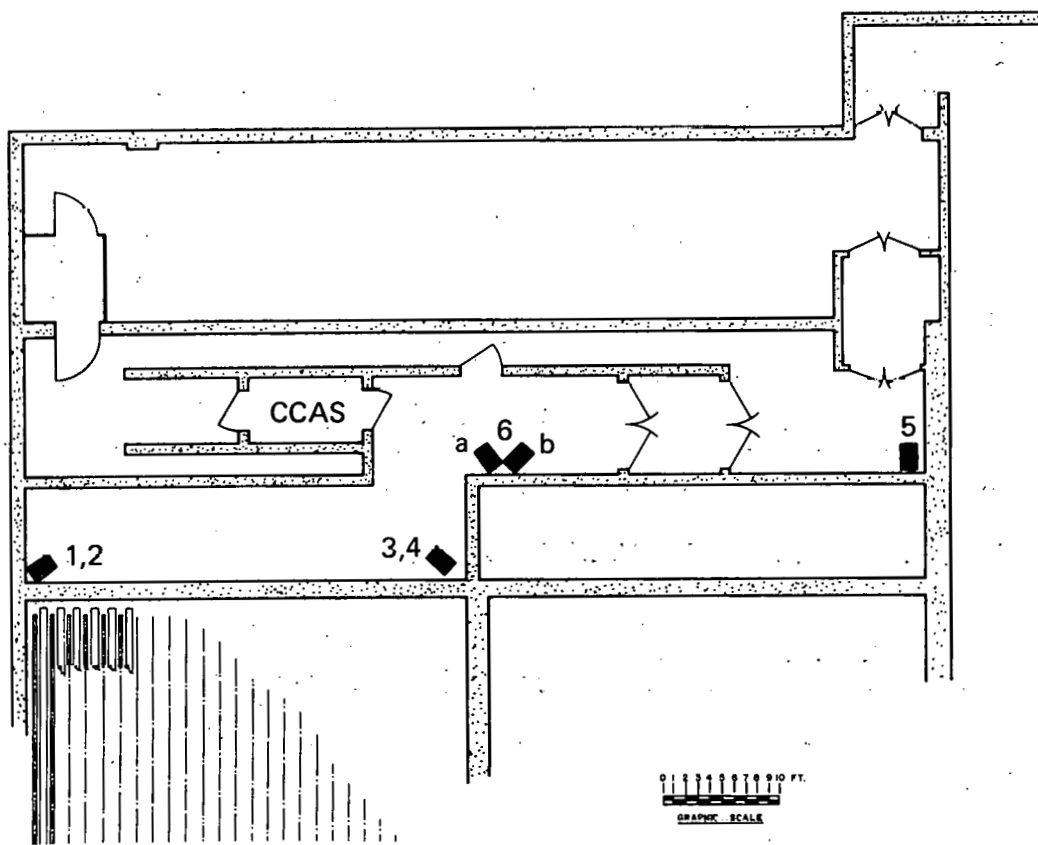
Location of CCTV Cameras - Plan View
